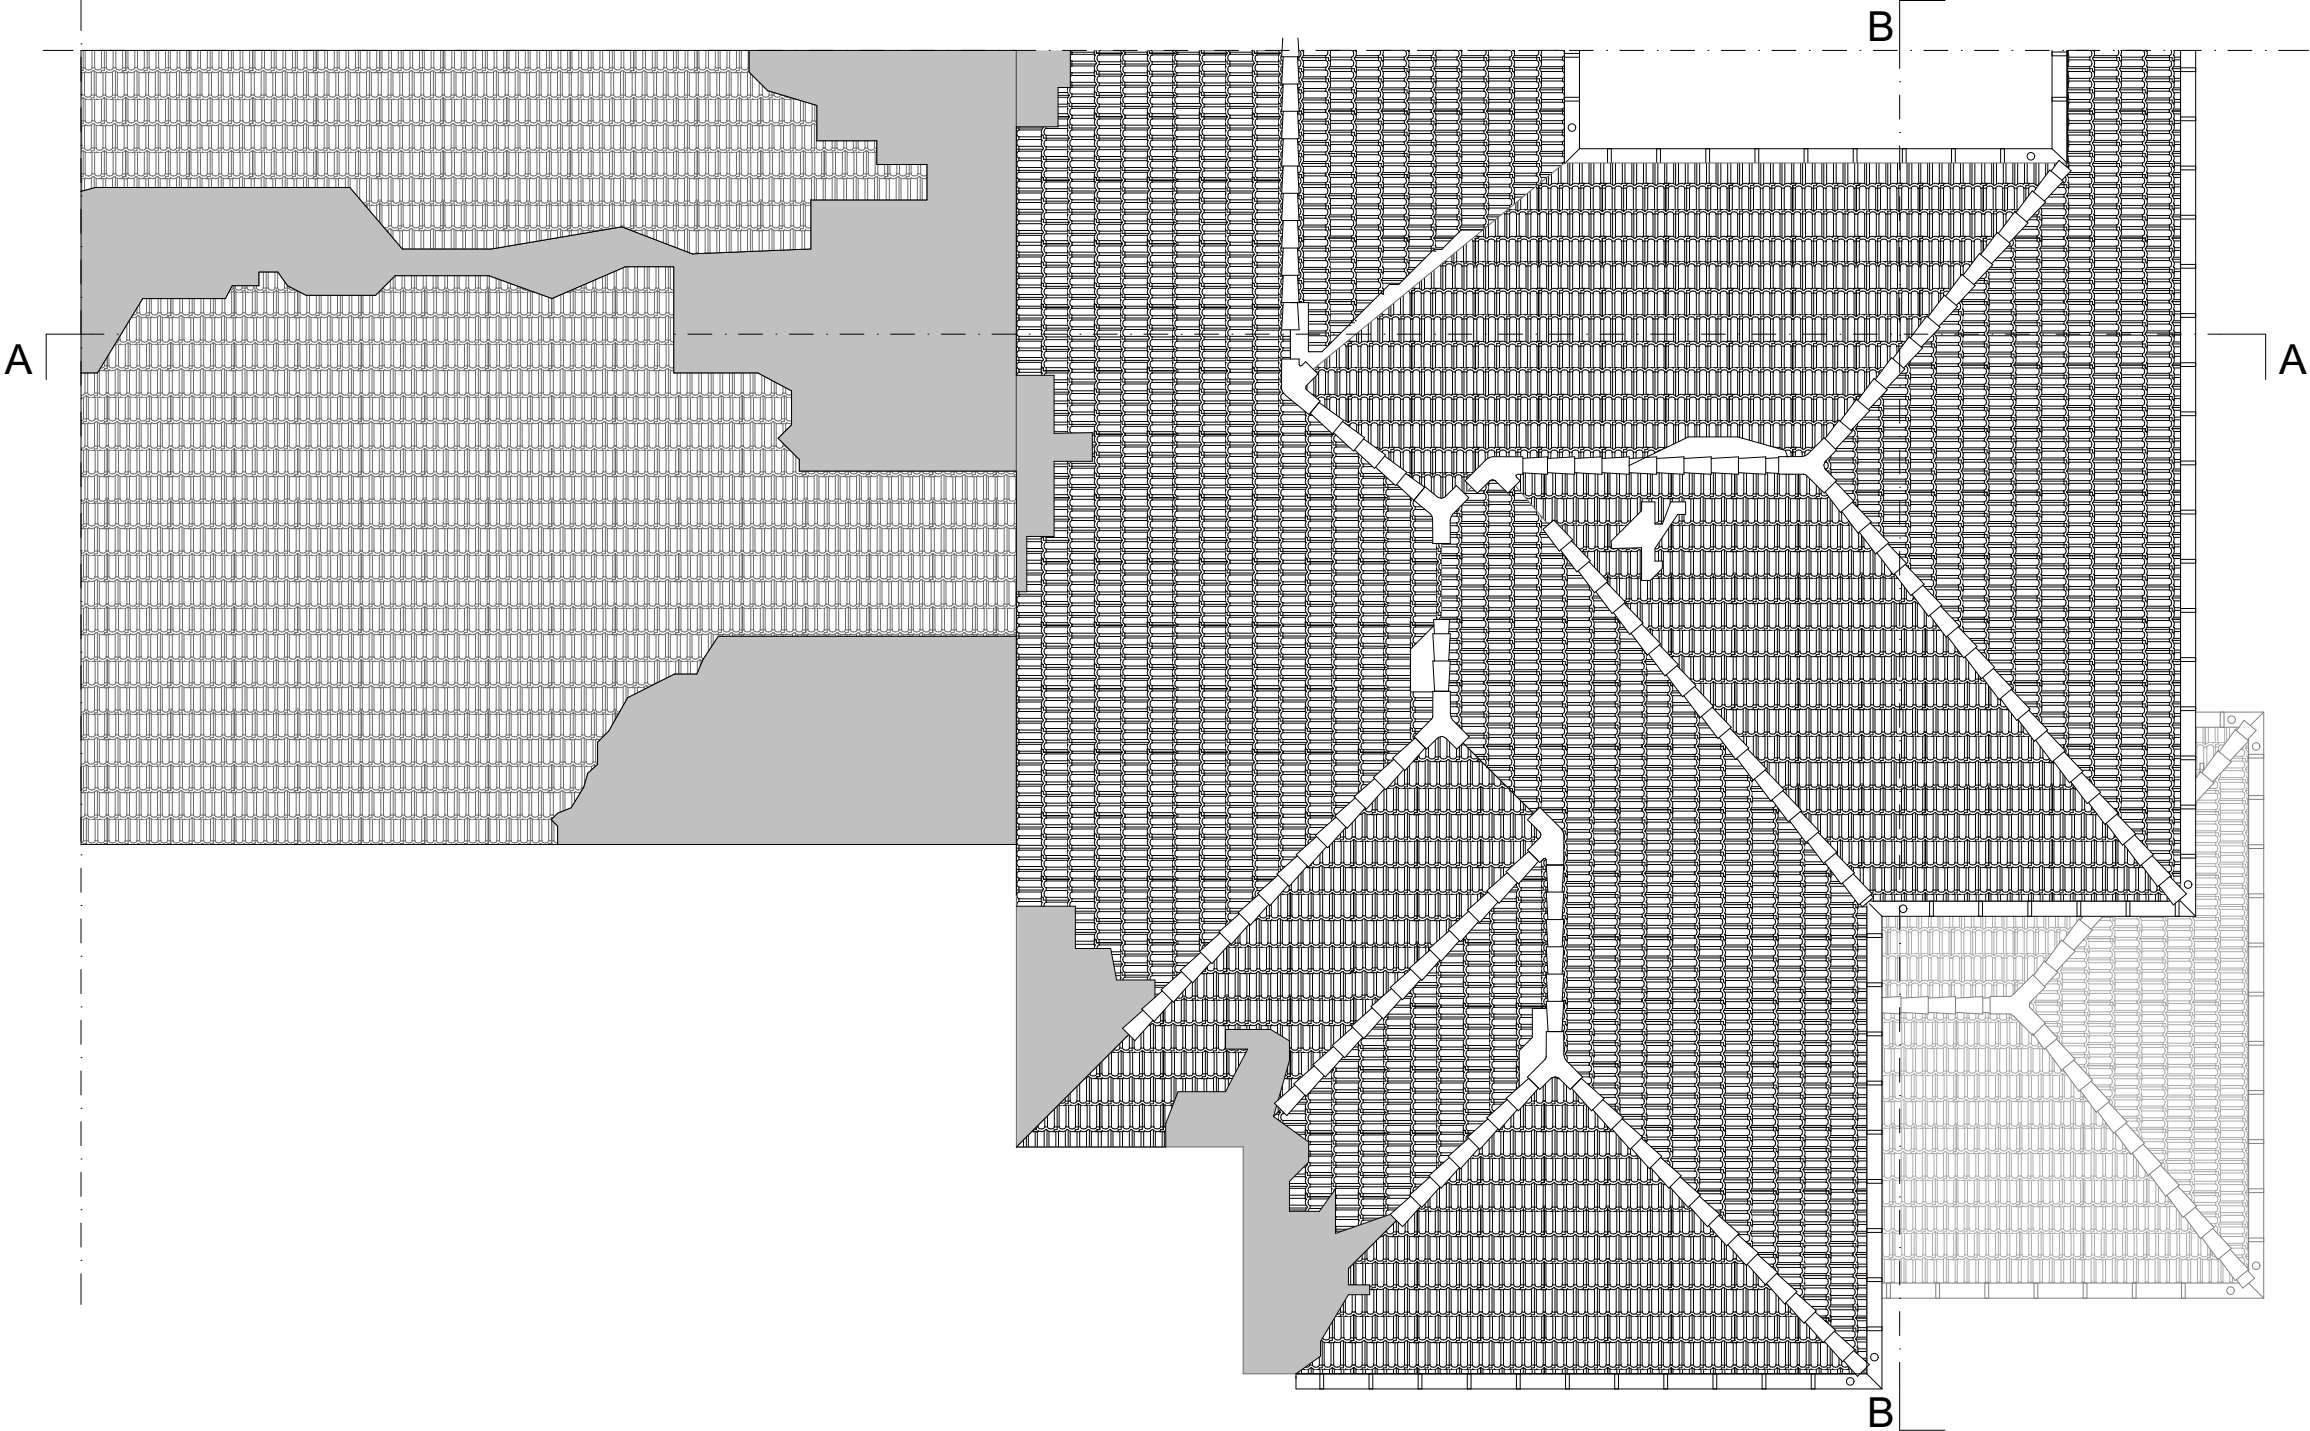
Roof Plan (Source: Created by the author, 2024)
